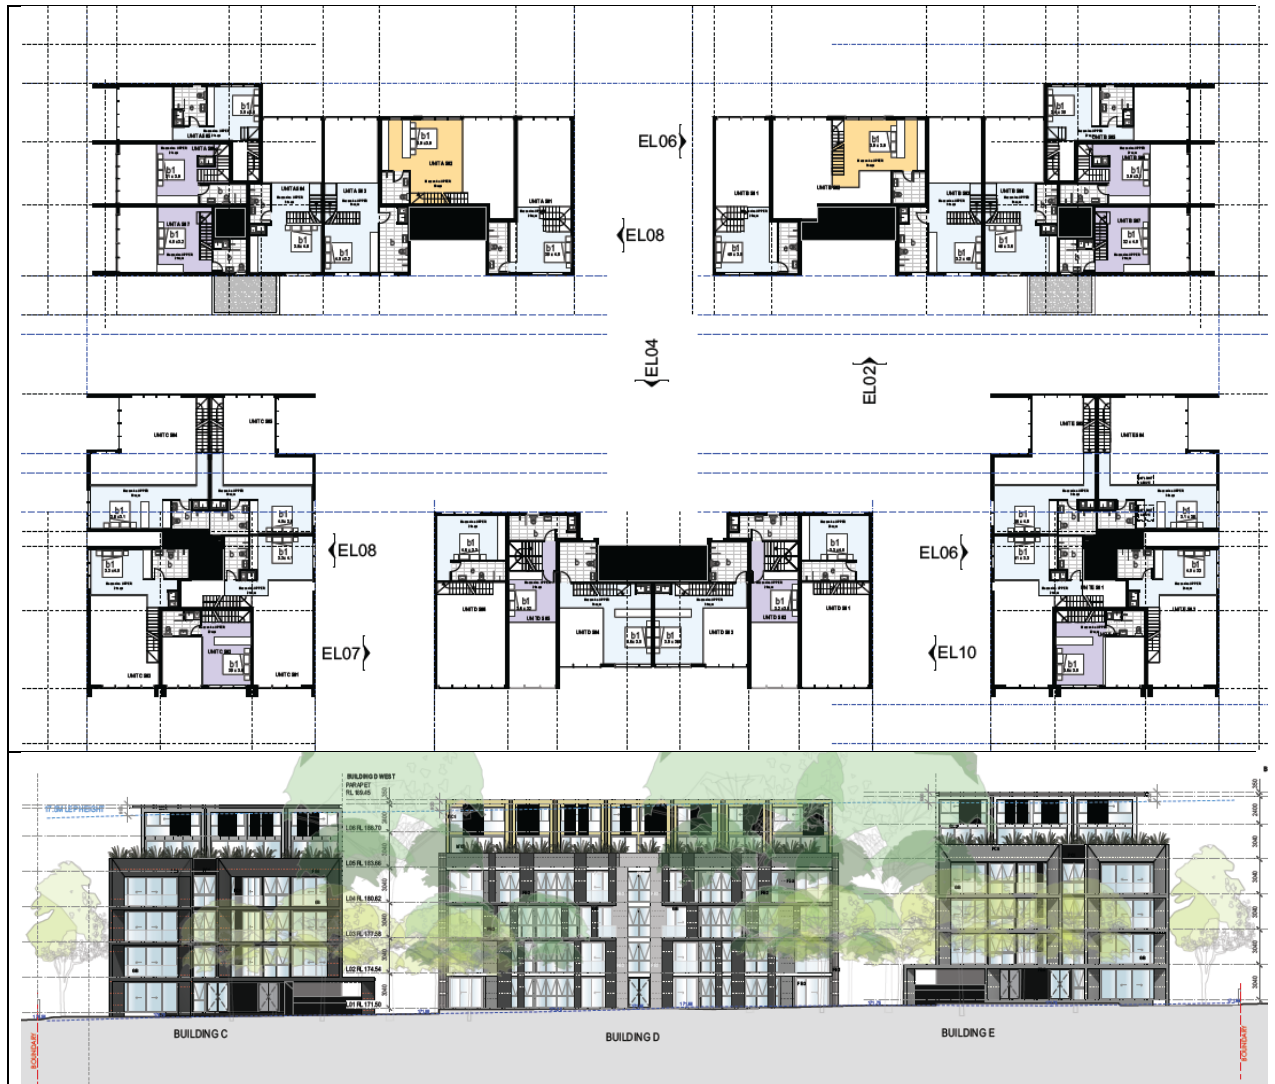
Upper floor plans for mezzanine style (top) and western elevation fronting Park Avenue (below)
